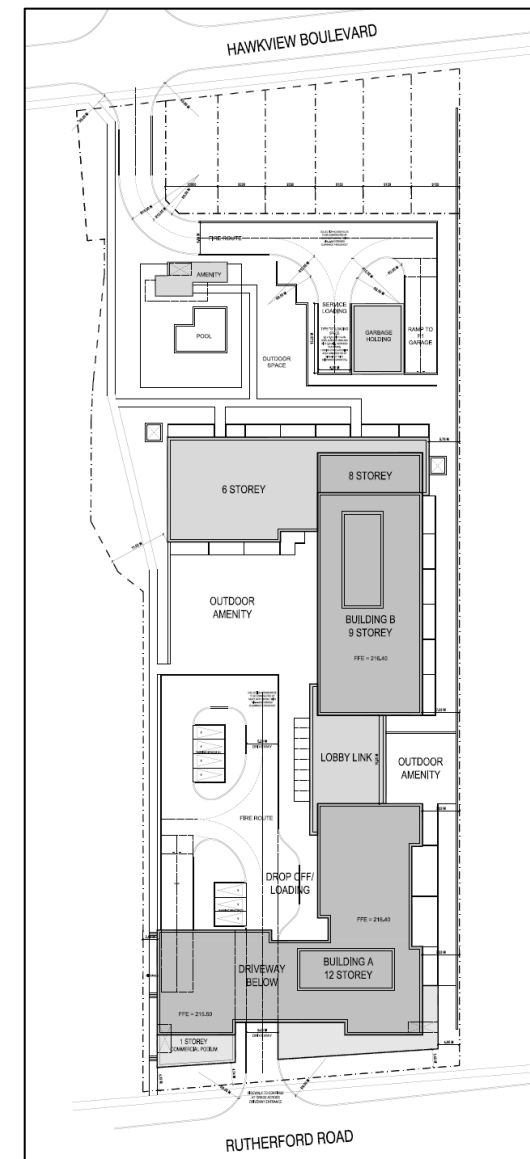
Site Plan (Re-Submission, May 20, 2014)
